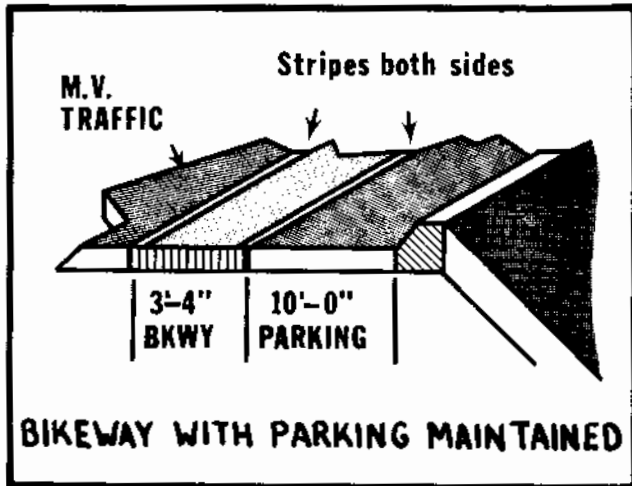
STRIPING LAYOUTS FOR BIKEWAY DESIGN
